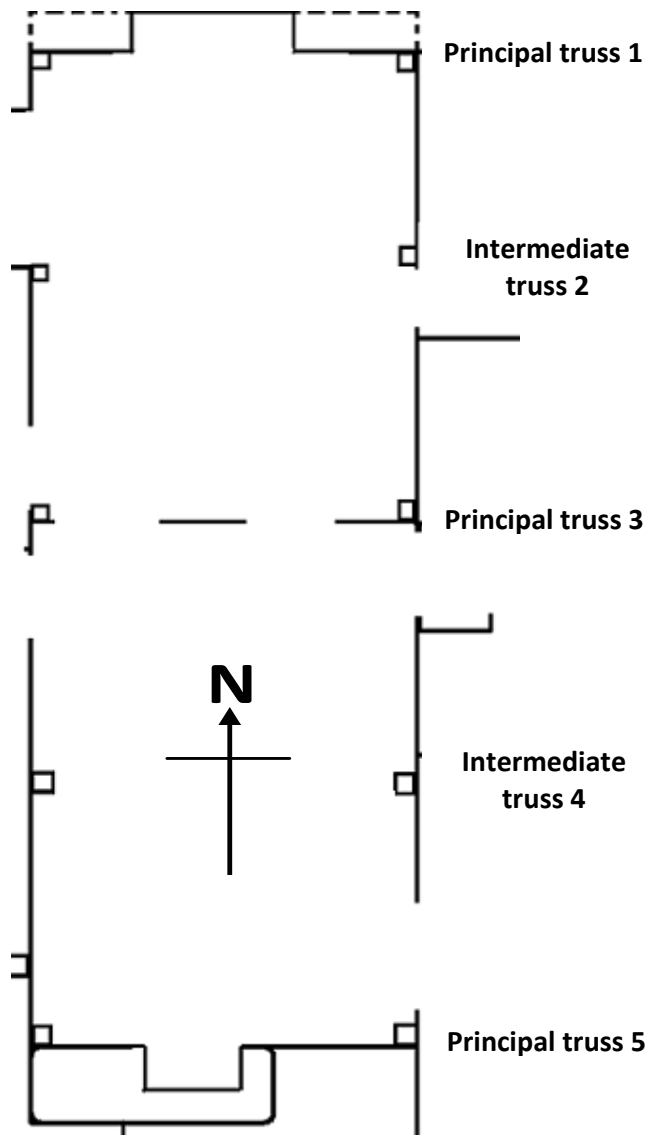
Simple plan of the cross-wing to show truss positions (after Clarke 1991)
